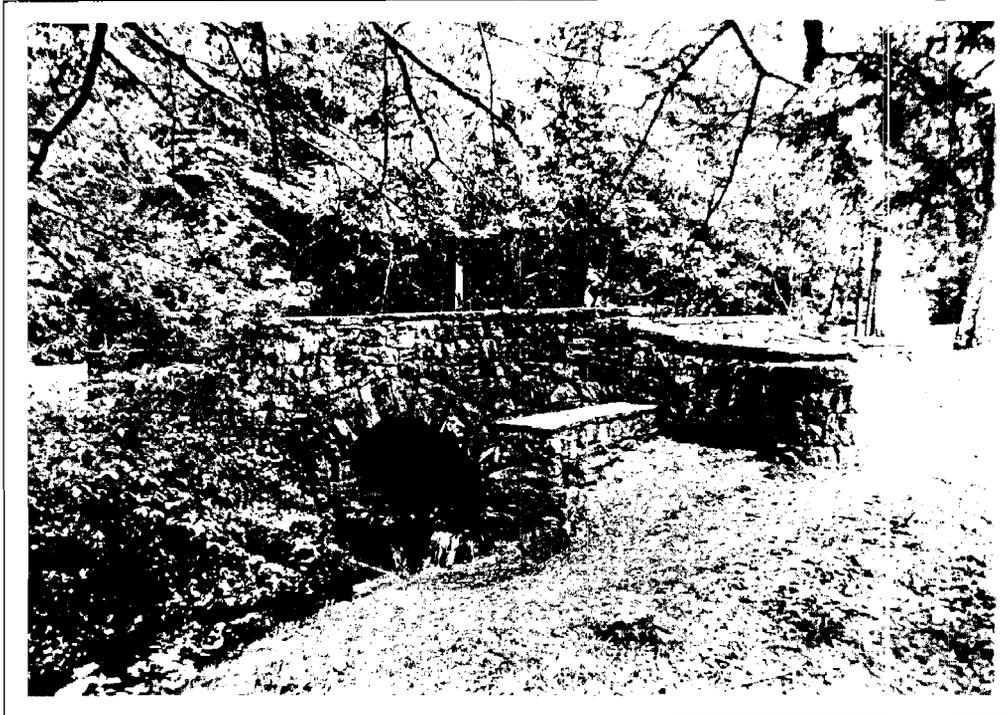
Valley Garden Park Footbridge, View to Northeast
